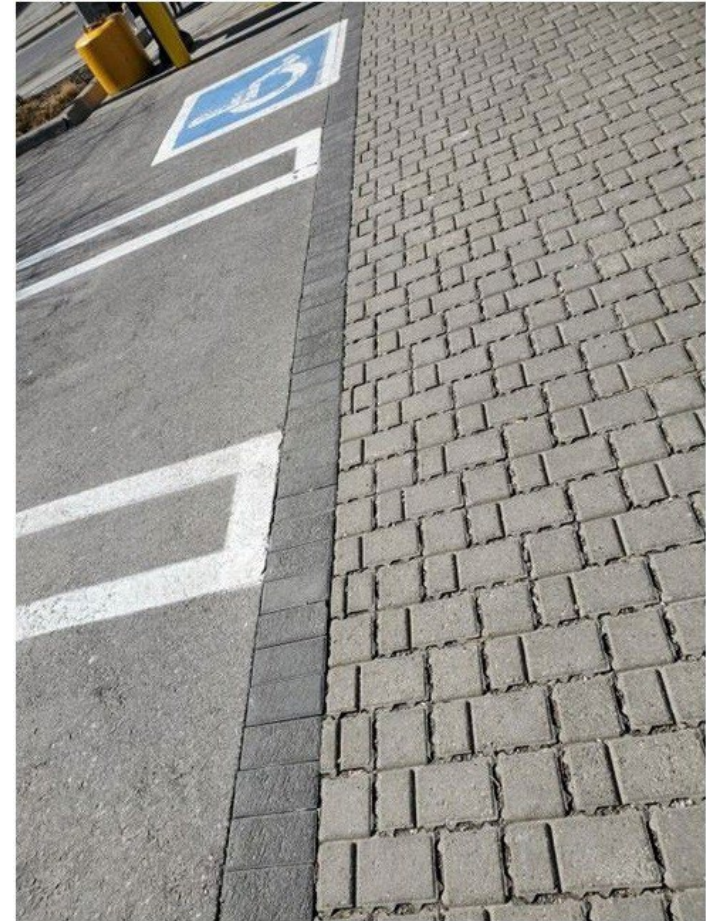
PICP at Green P lot, North of Dundas Street West at Manning Avenue
